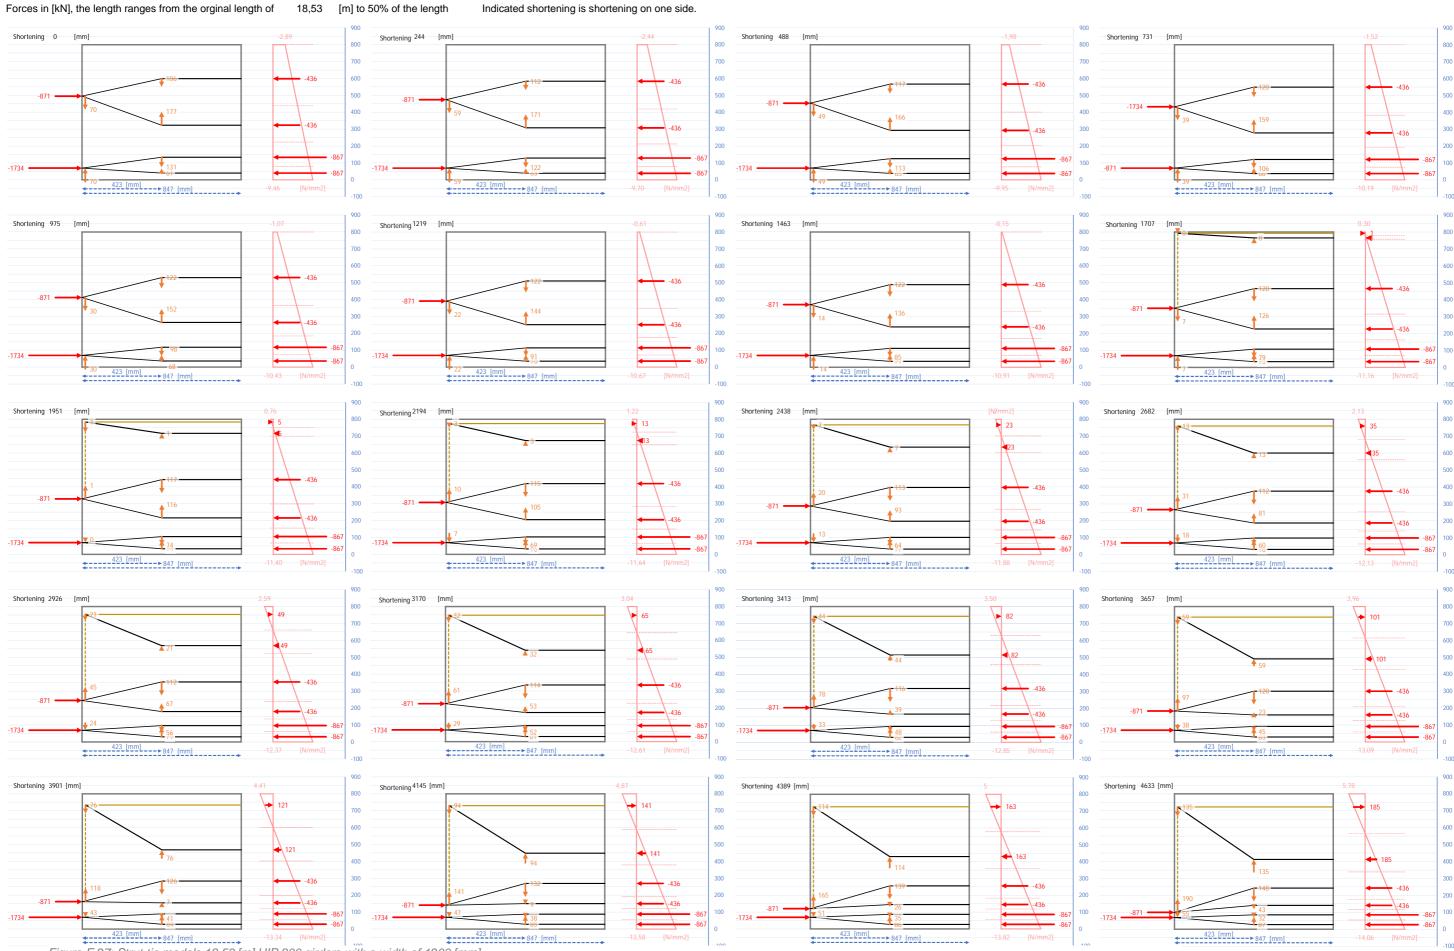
Strut-tie models 18,53 [m] HIP 800 girders with a width of 1200 [mm].
